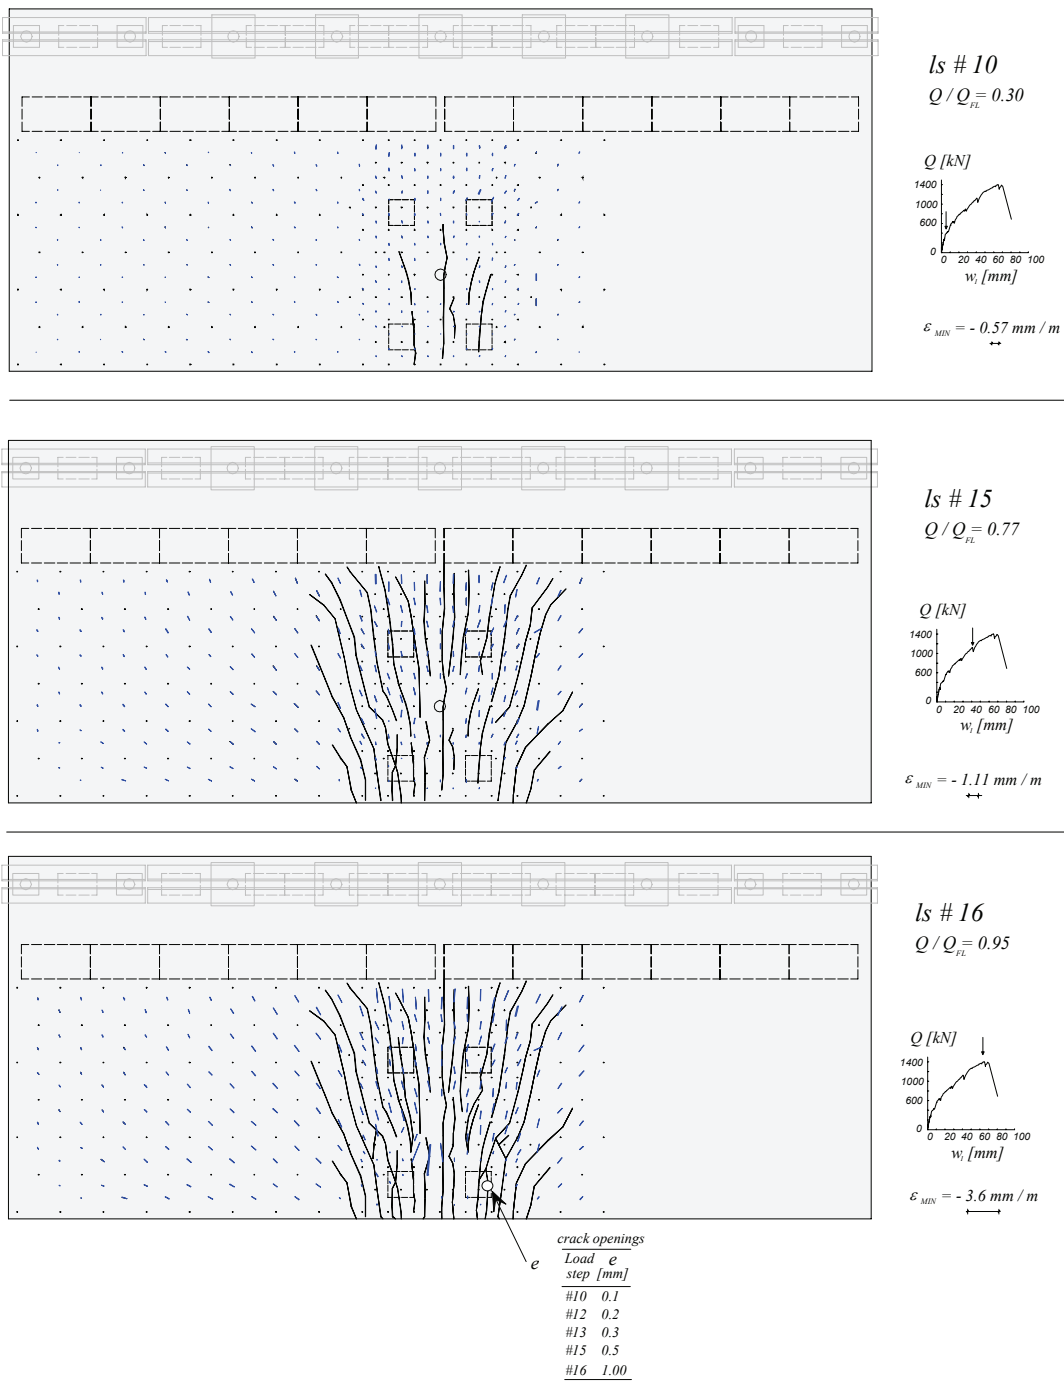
Test DRI-a: Crack pattern and compressive principal strains on the bottom surface (as seen from above)
